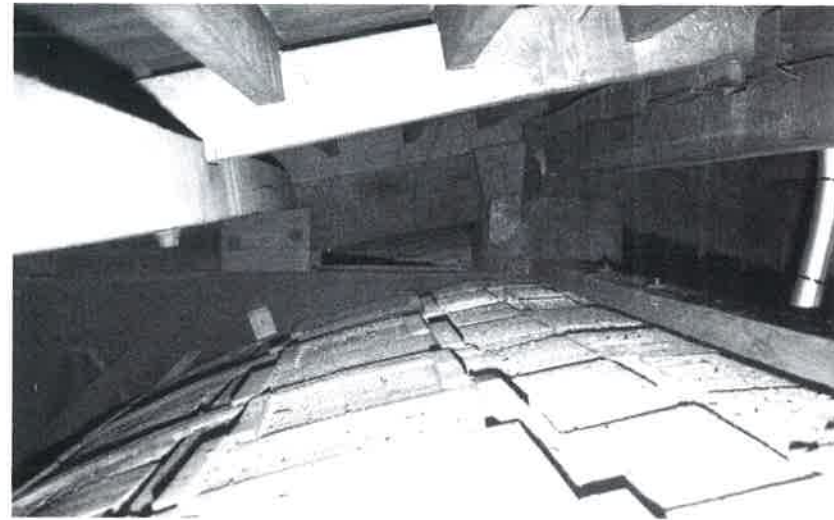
View towards Truss 4 from the east showing secondary scarfed ridge piece added when the louvre was removed
